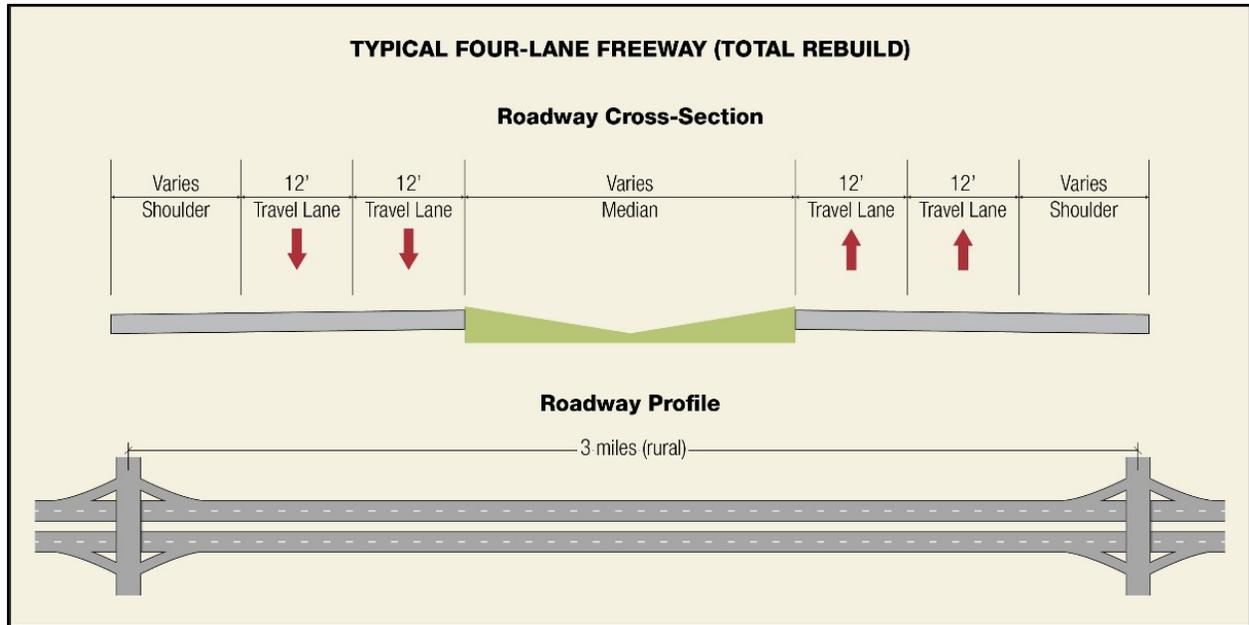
Typical Four-Lane Freeway (Total Rebuild) Roadway Profile and Cross-Section
